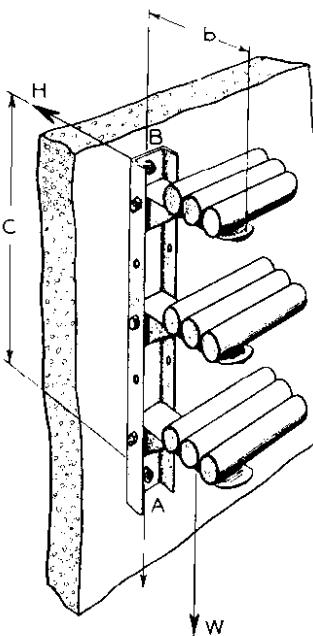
EFFECT OF LADEN CABLE BEARERS ON WALL LOADINGS.
